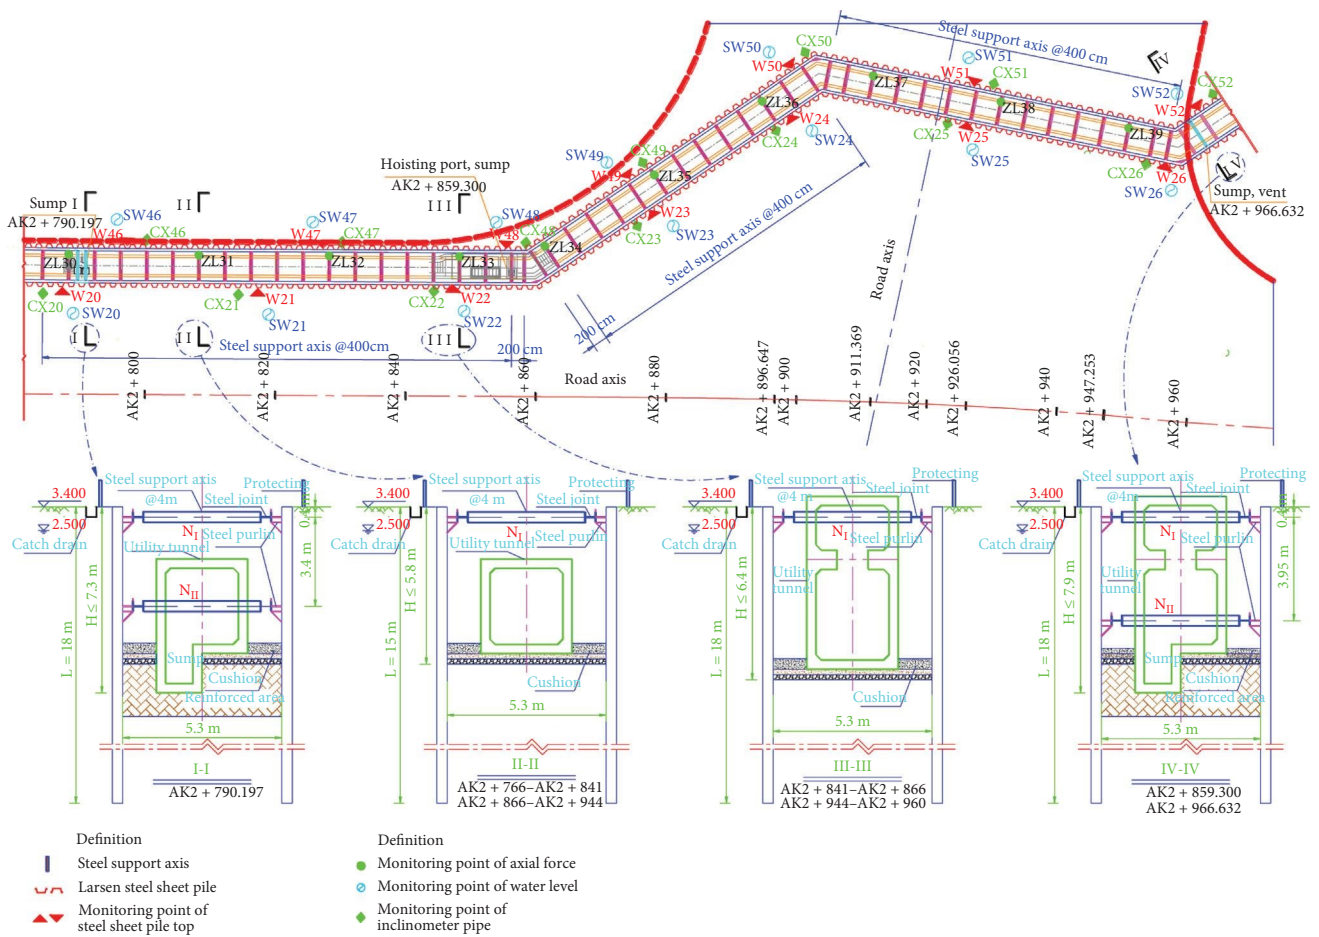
Monitoring layout plan and section of the steel sheet pile support.
